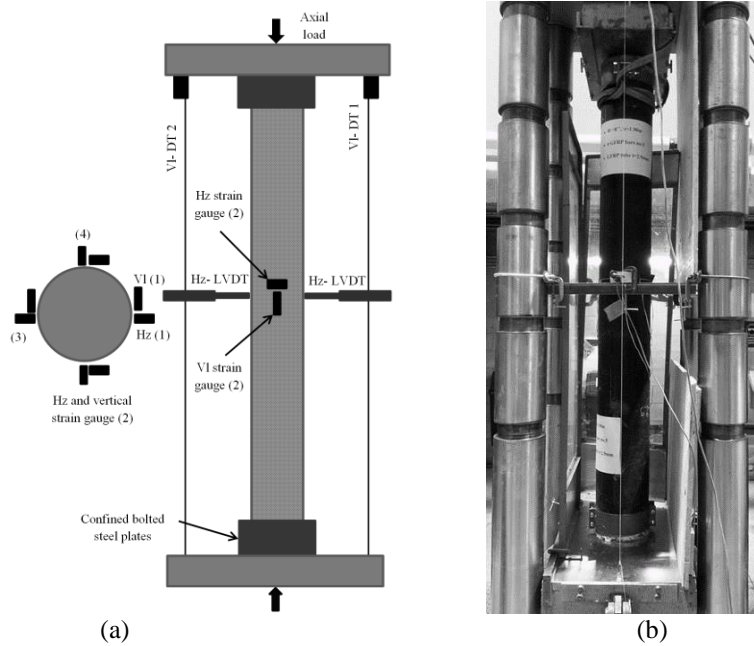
Instrumentations and Test setup: (a) schematic of the test setup and placing of specimen instrumentations; (b) test specimen inside the testing machine
